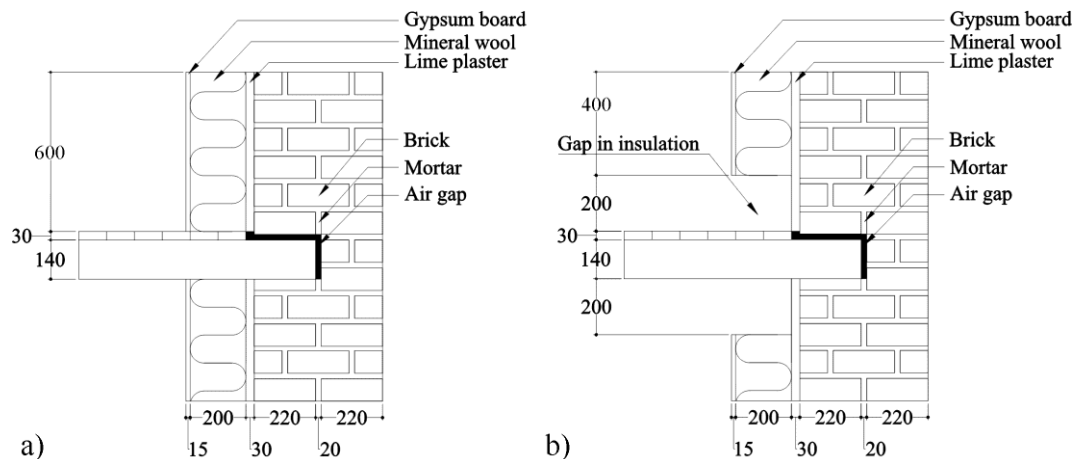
Detailed description of the beam end and wall joint. The vapour barrier is placed between the gypsum board and mineral wool. a) The measure without a gap and b) the applied insulation with a gap.
